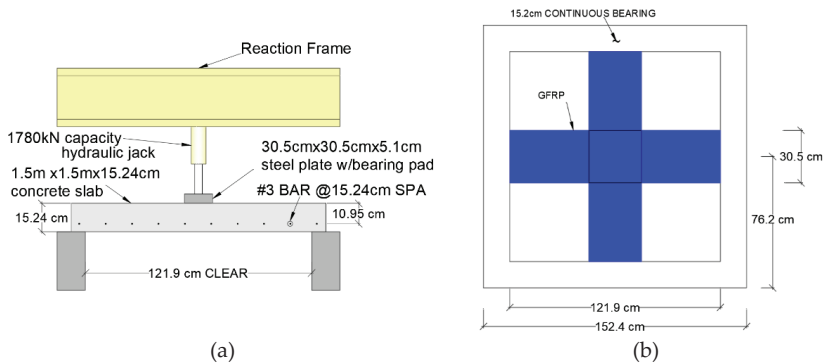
(a) Test apparatus with loading from top of the slab producing tension at the bottom, (b) 30.4 cm wide GFRP strips bonded to the tension face [38].
